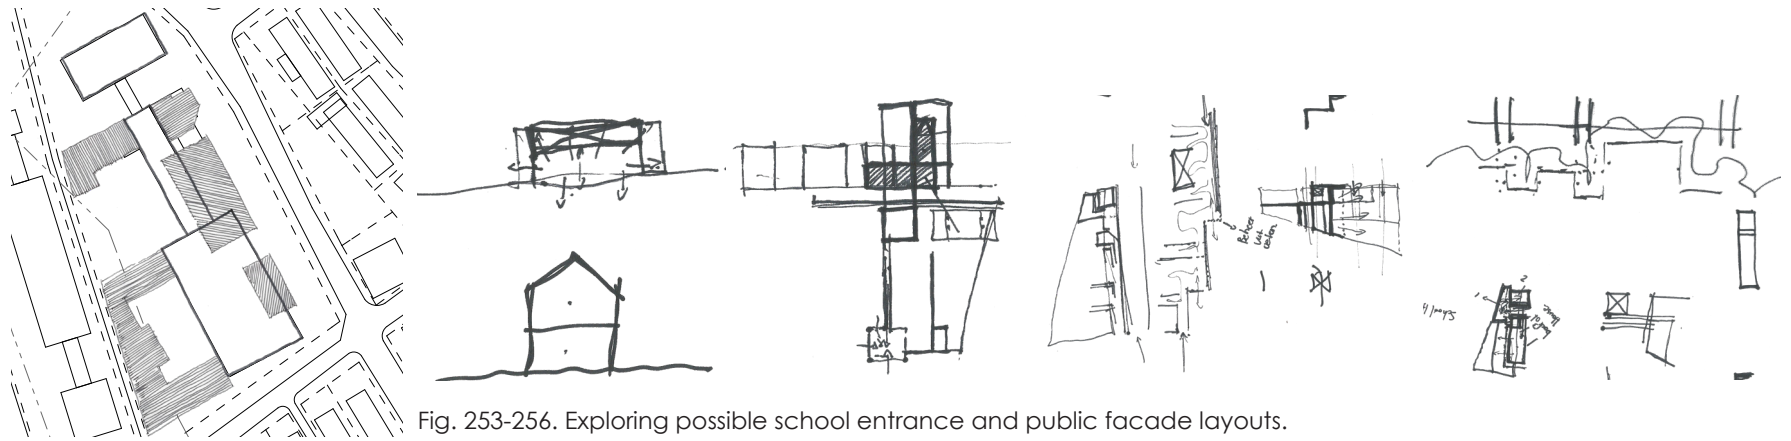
Exploring possible school entrance and public facade layouts.
